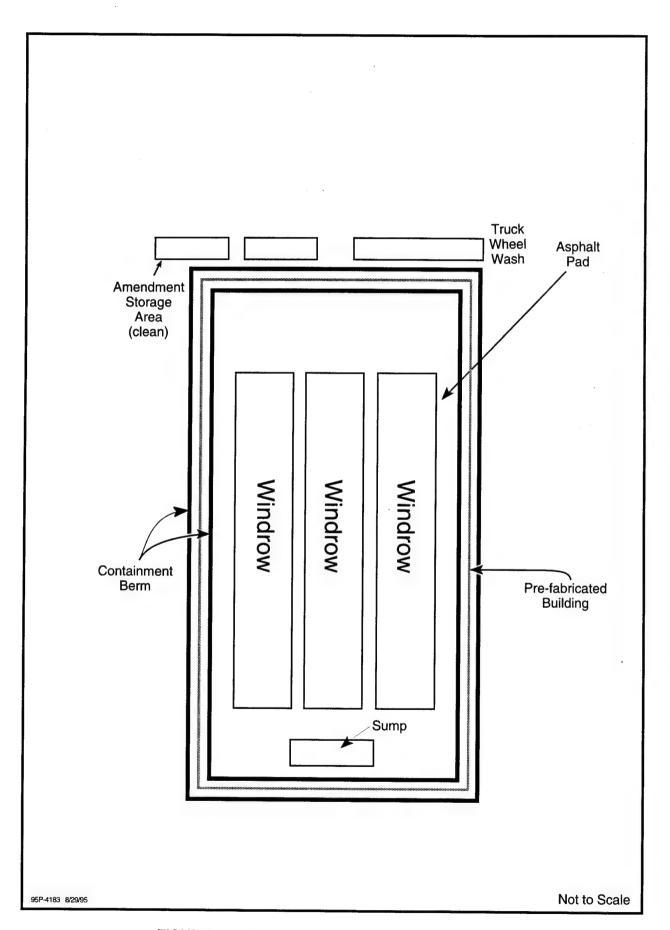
SITE LAYOUT FOR WINDROW FACILITY
